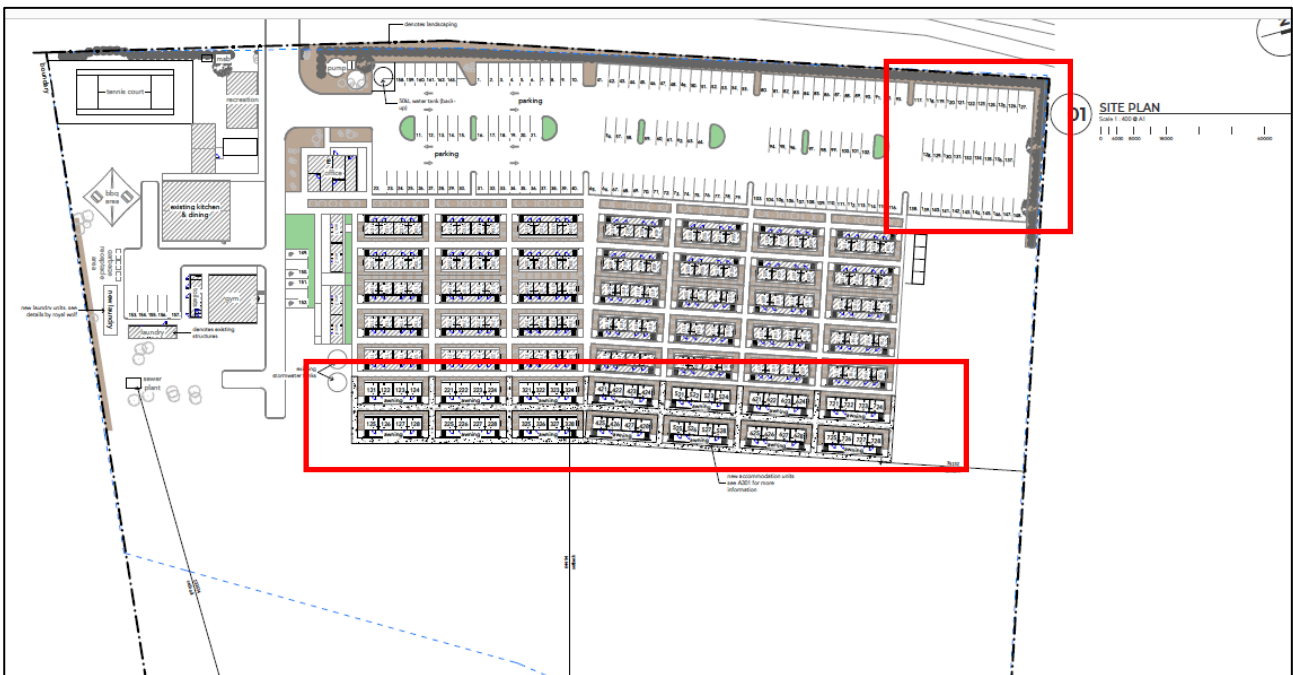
Proposed Site Plan dated 08.05.2023 (Appendix C to SEE submitted 24 November 2023)
